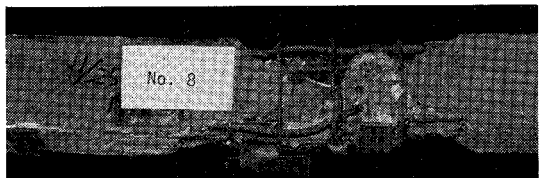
Test Piece after Loading ( $\mu=5.37$ )
